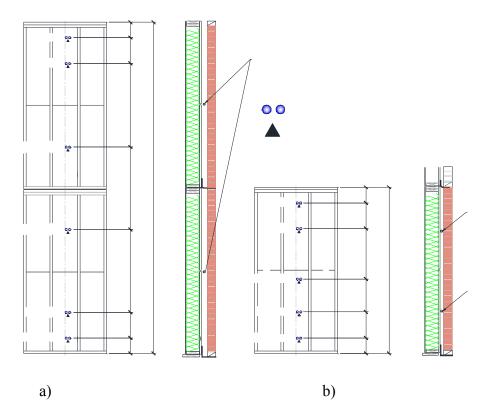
Typical Sensor Positions in Plywood Sheathing and Air Gap: a) BW1 and BW2 and b) BW3 and BW4
